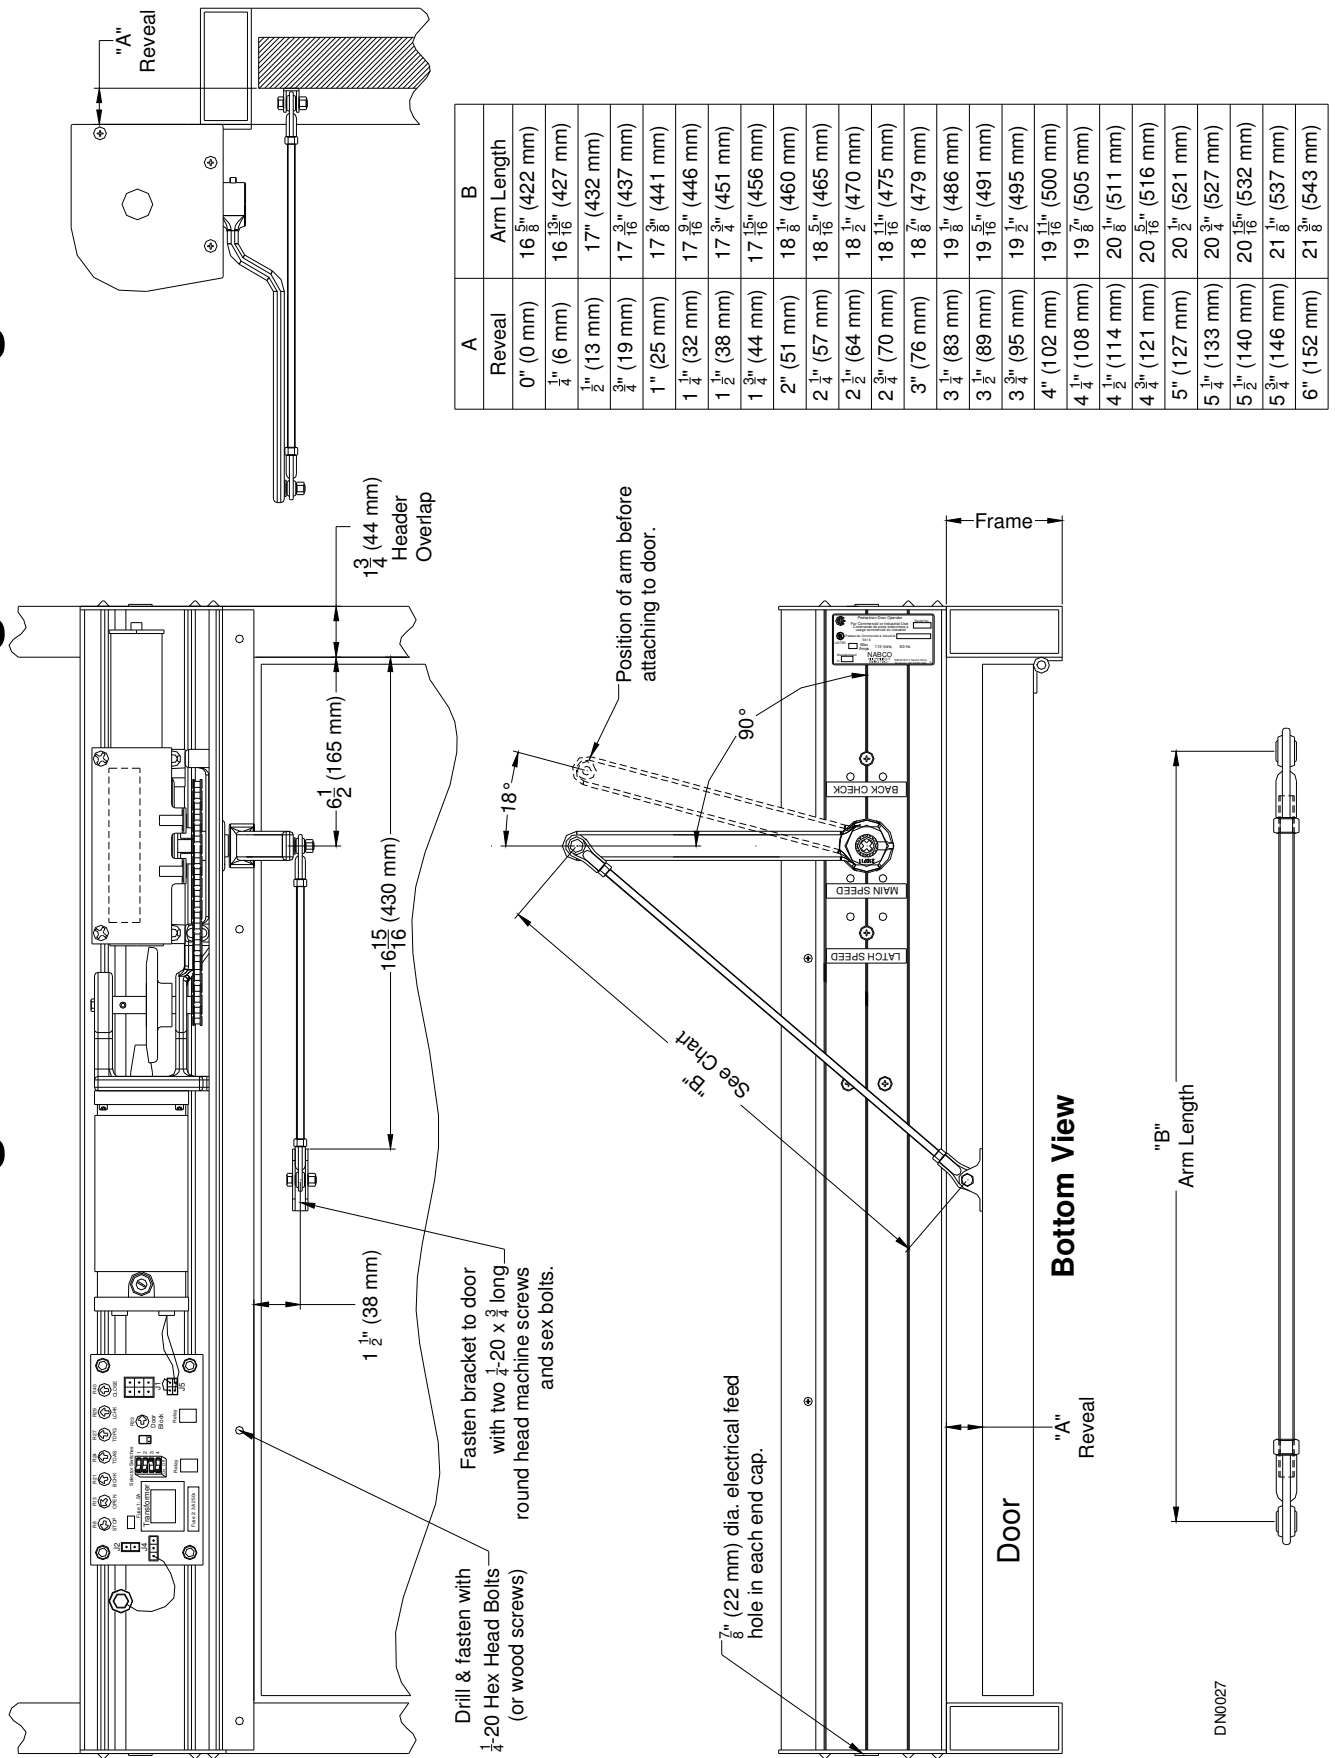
Installation Details, Right Hand Outswing Butt Hinge.
